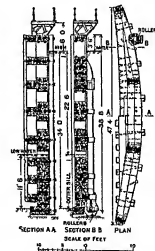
TIMBER DOCK GATES ALEXANDRA DOCK HULL ENG
